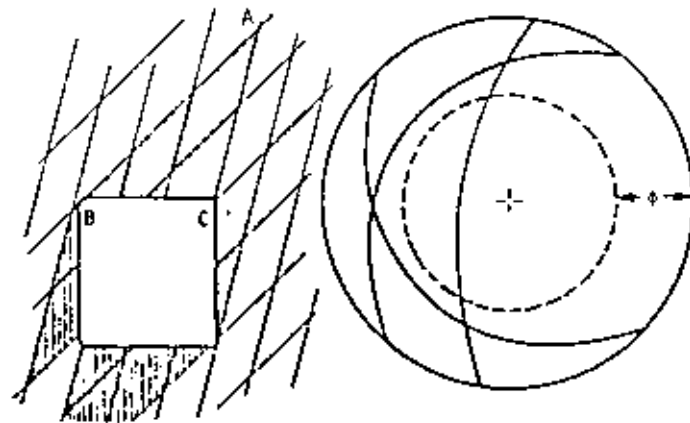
Kinematic check for the sliding of wedges from the roof or sidewalls of an excavation.
